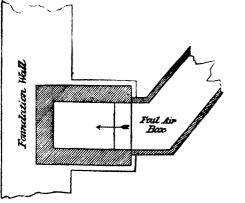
PLAN AT BOTTOM OF VENTILATING SHAFT.
